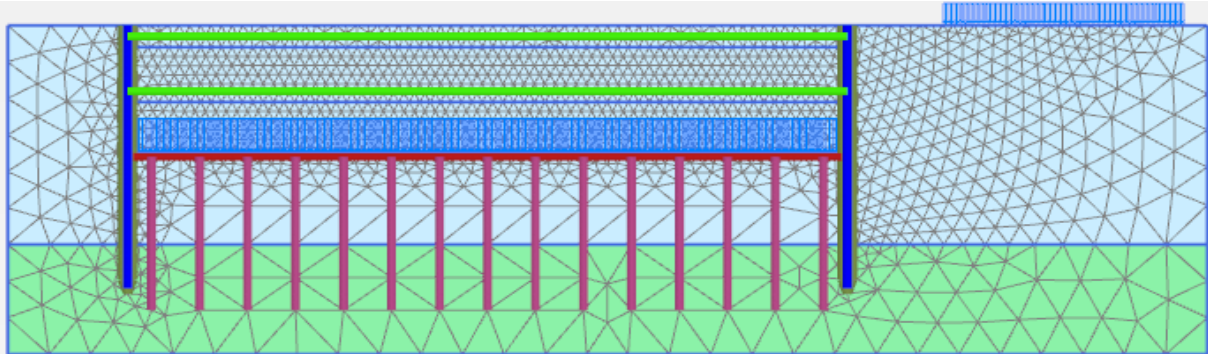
Diaphragm wall model with double basement with adjacent load
